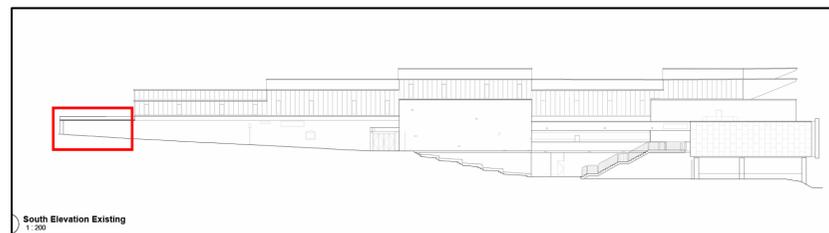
The Princess Street elevation as original, with area of wall consented to be removed highlighted.
